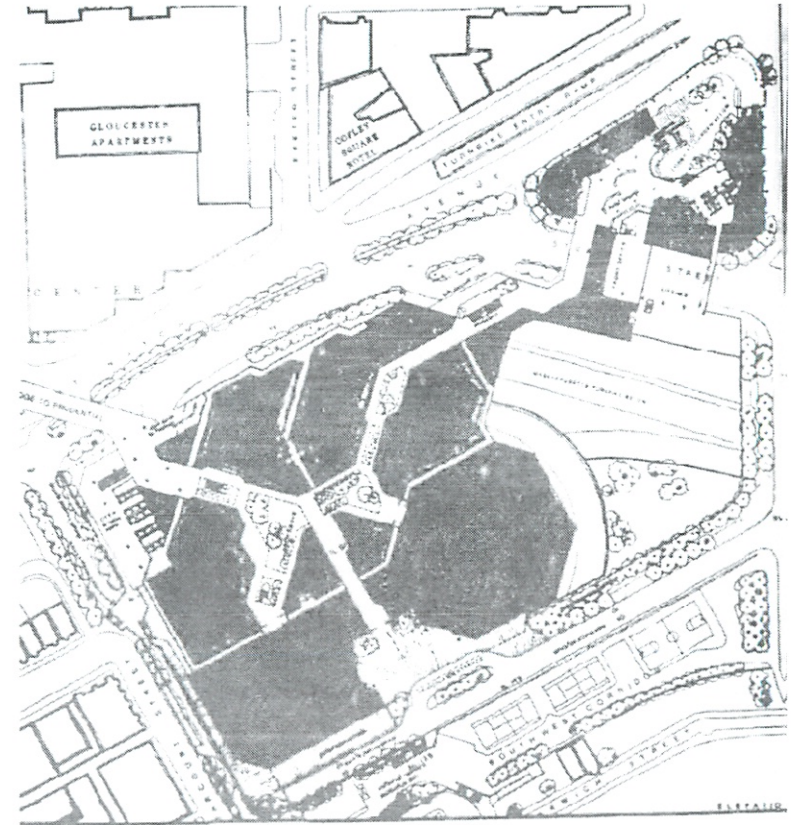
EARLY CONCEPT SKETCH, ELEVATION 143
